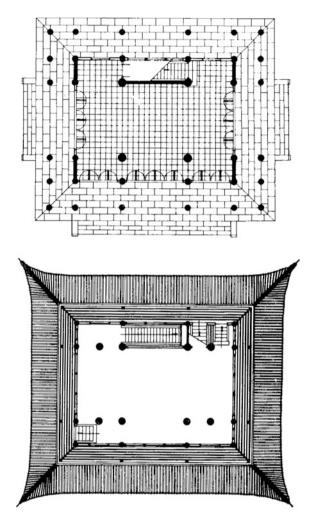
Plan drawings of the first (upper) and second (bottom) floors (of the Yueyang Tower. The tower is three rooms long and three rooms wide, with an exterior corridor. *Source* Yang (1993: 179, 181)
